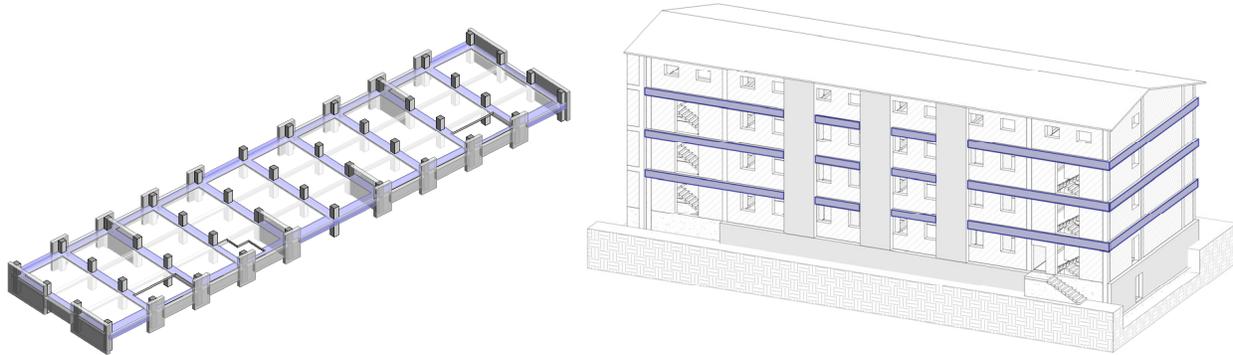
New collectors and chords at the perimeter of the diaphragm (in blue). The transverse elements in blue are added collectors where they align with walls. The blue transverse elements between the walls are required to strengthen the diaphragm.
